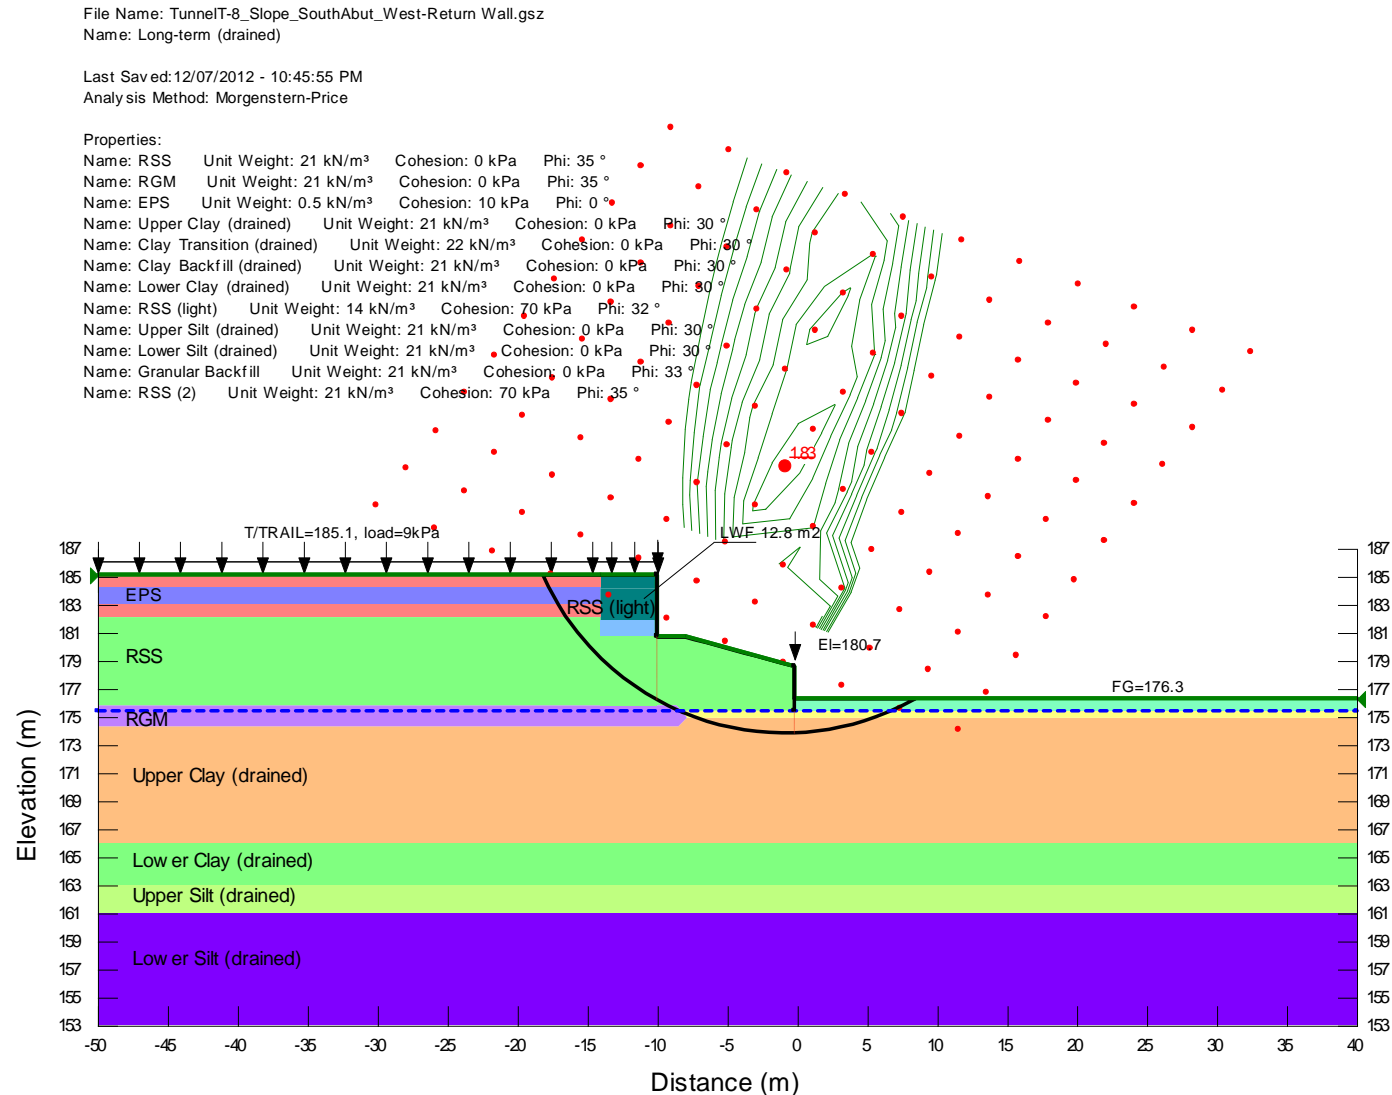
Global Stability Result – Return Wingwall South (East Segment)– Long Term (Drained) Loading
